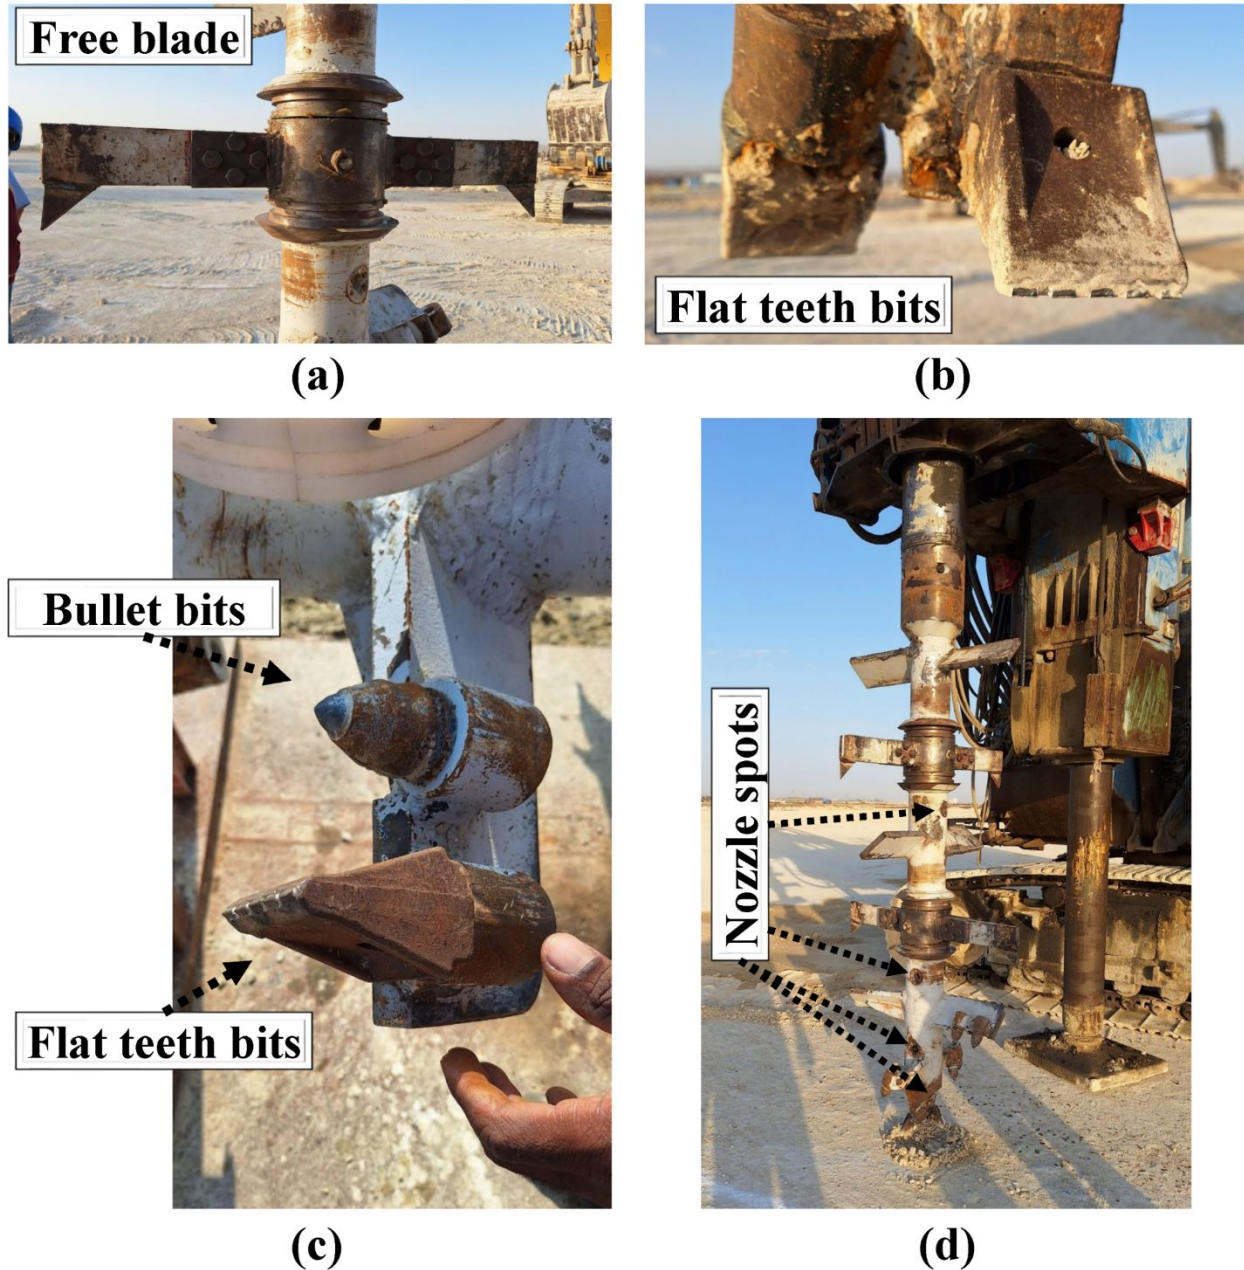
Details of drilling auger: a) free blade layer, b) using flat teeth bits at the bottom of the auger, c) simultaneously use of bullet and flat teeth bits for the cutting blades, and d) implemented nozzle spots
